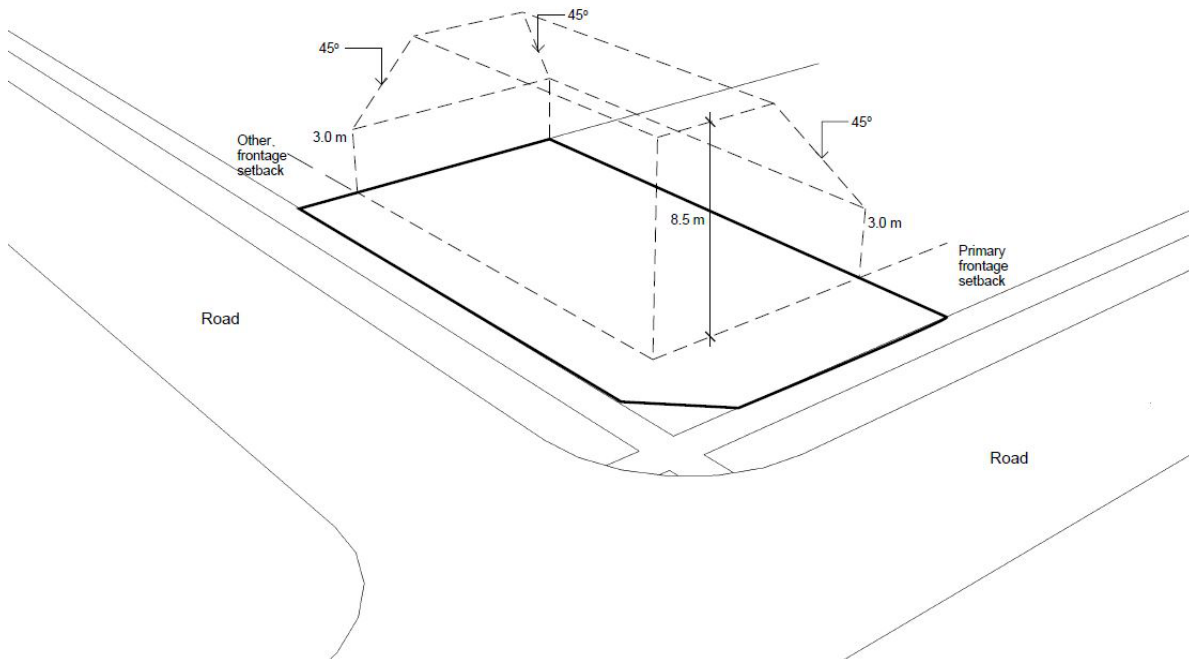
Building envelope for corner lots as required by clause 10.4.2 A3(a)
